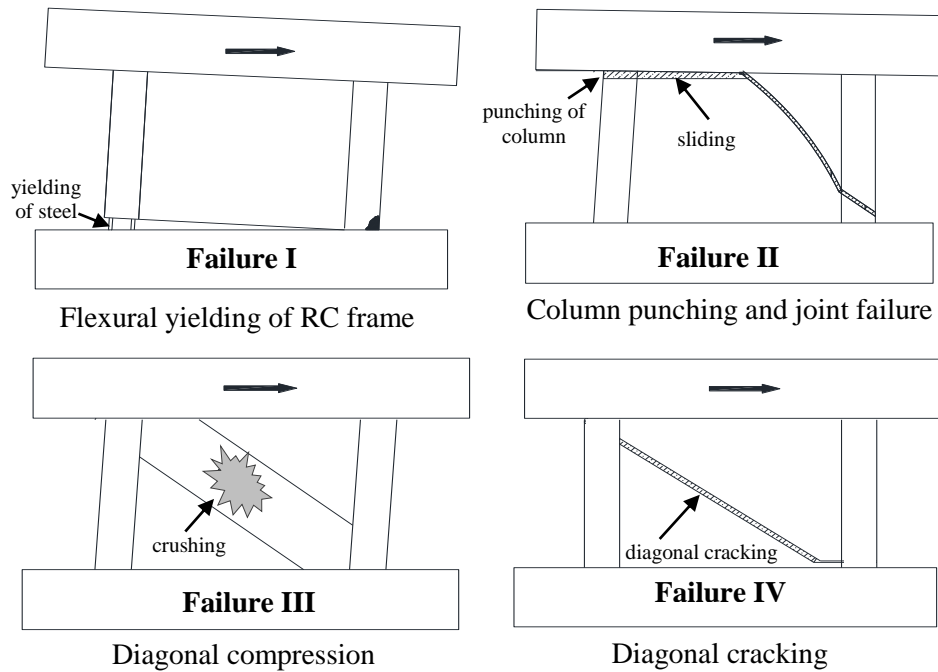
All possible failure modes of ferro-cement laminated masonry infilled RC frame
